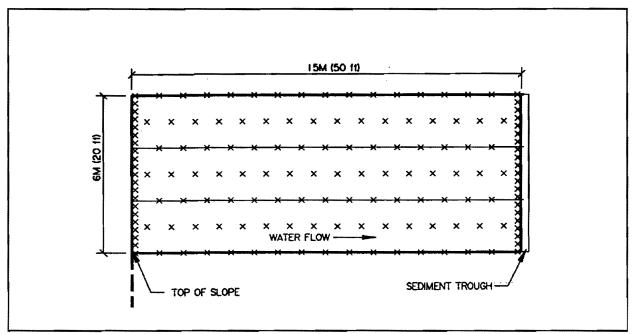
DEKOWE® 700 1:2 Installation Plan.
